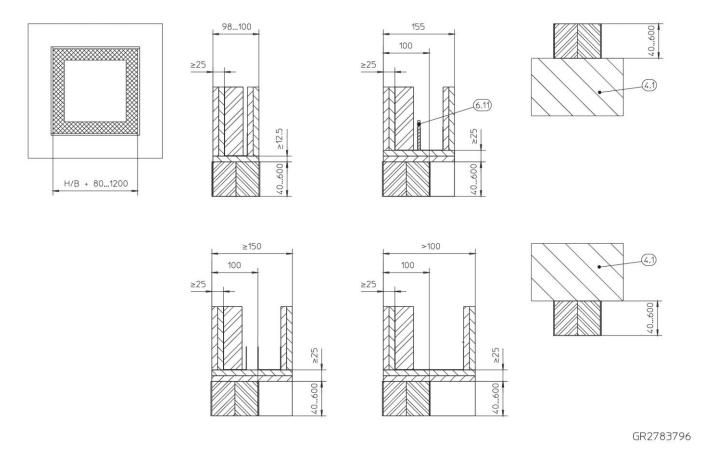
Dry mortarless installation into a lightweight partition wall, with a fire batt, approved combinations for thicker walls
